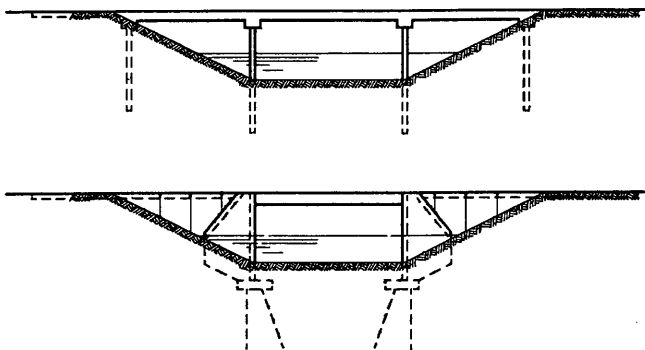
Different bridge types for the same site: (top) multiple-span integral bridge with stub-type abutments; (bottom) single span with movable bearings and wall-type abutments.
